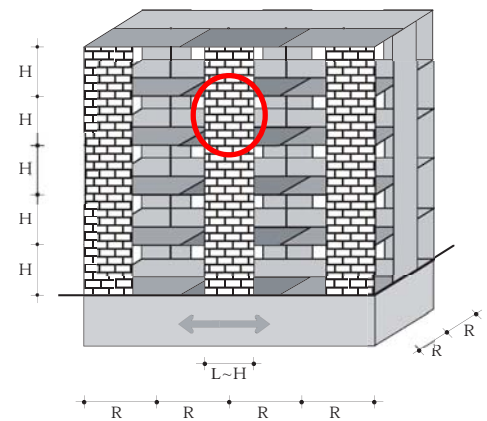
Five-Story Building With External URM Walls And Slender Columns.
